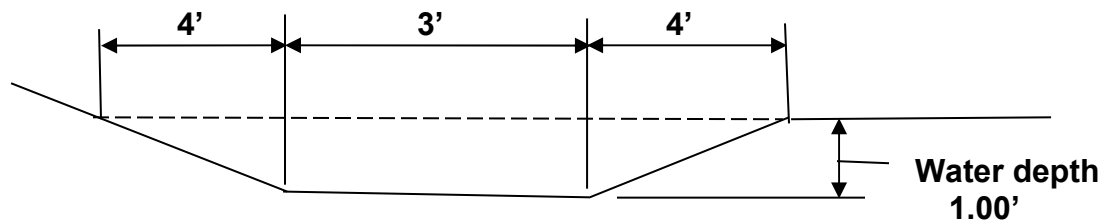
Cross-Section, Drainage Channel Section Four
